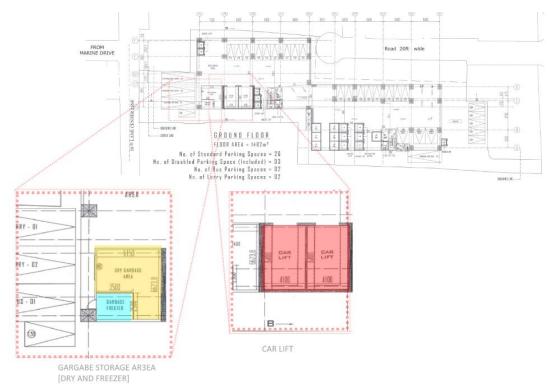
Temporary Garbage (Dry and Freezer) Storage on Ground Floor
